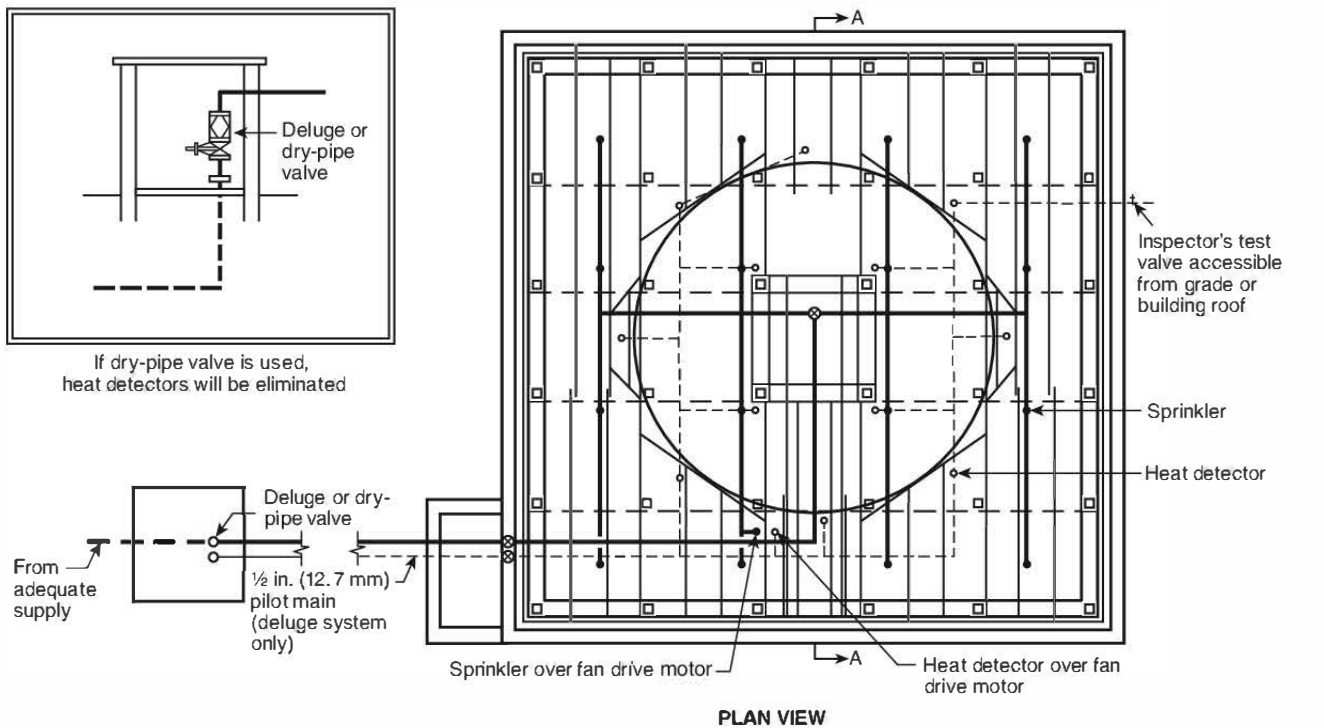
(c) Plan View, Typical Deluge or Dry-Pipe Fire Protection Arrangement for Counterflow Towers.
